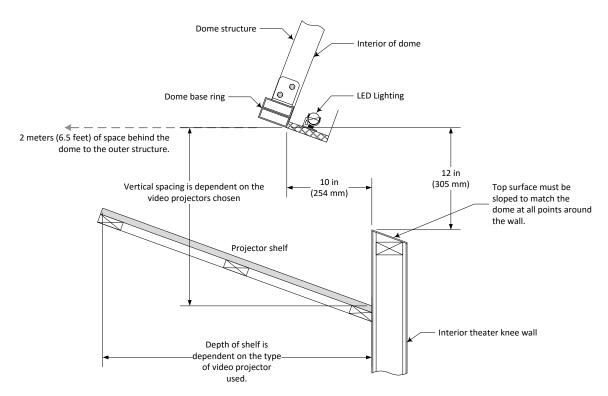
Cove: Dome and Knee Wall Spacing (Tilted Dome, Rear Center)
